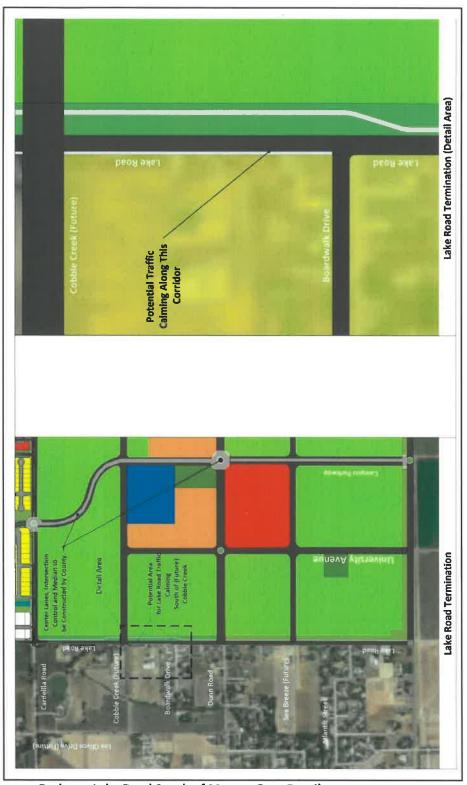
Campus Parkway Lake Road South of Meyers Gate Detail
